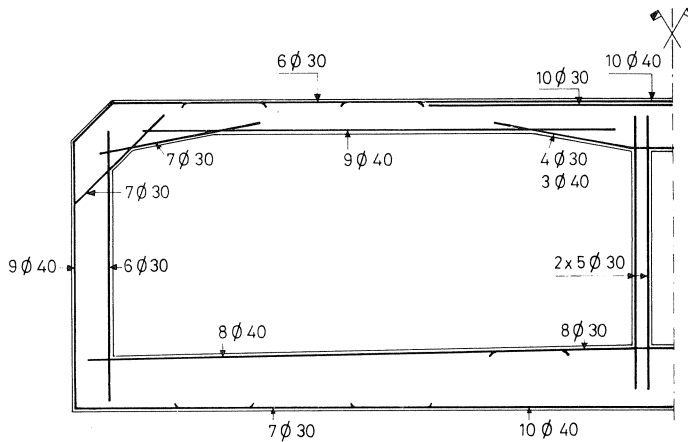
Tunnel reinforcement for a 1.5 m wide section.
